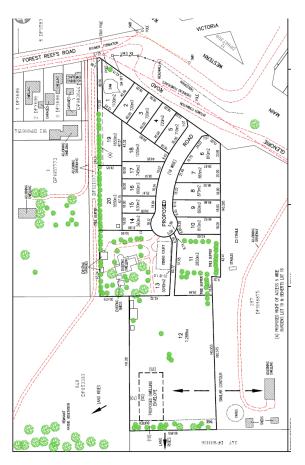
Proposed subdivision concept layout by Peter Basha Planning and Development if property is rezoned to RU5 Village.
